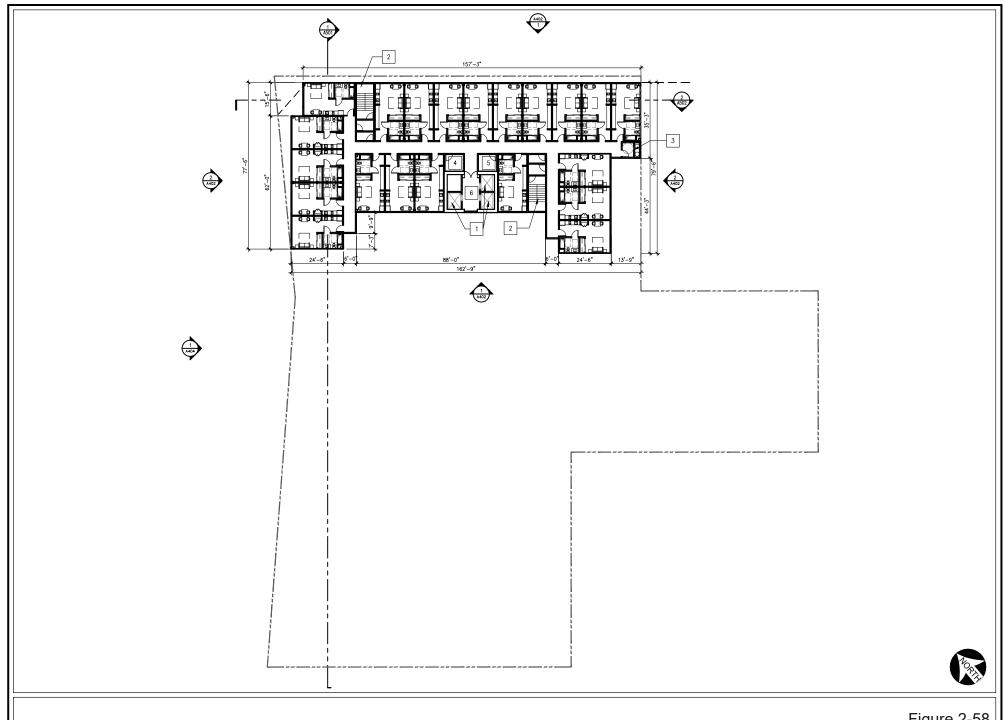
Level 17 and 18 Floor Plan - Site 2
